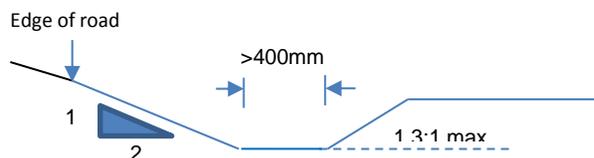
Typical cross section, DC1 – 4, Flat Terrain, Unpaved
